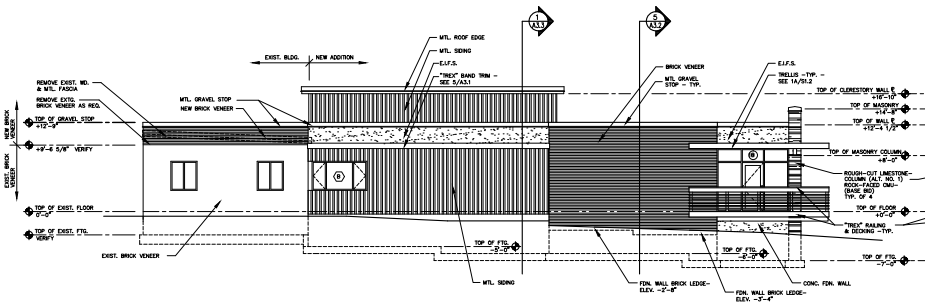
LONI North Elevation. From Waggoner and Wineinger Architects.
